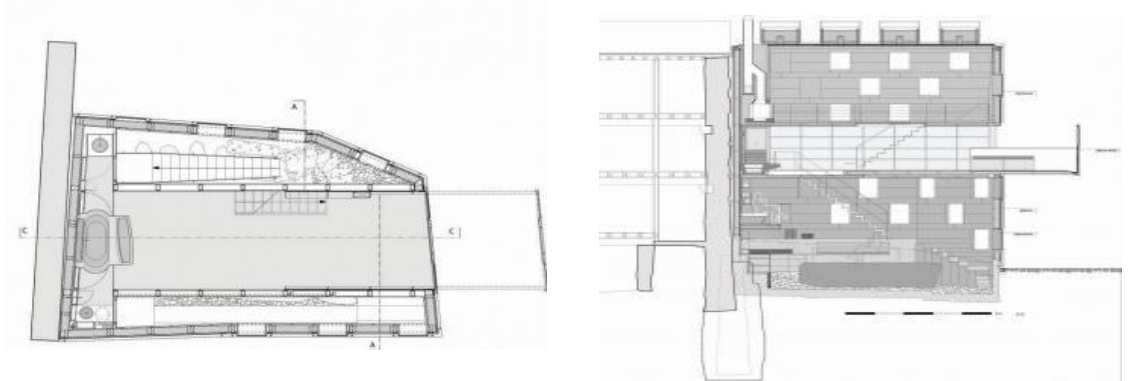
(a) plan and (b) section showing the expansion of the living room as it's pulled out
